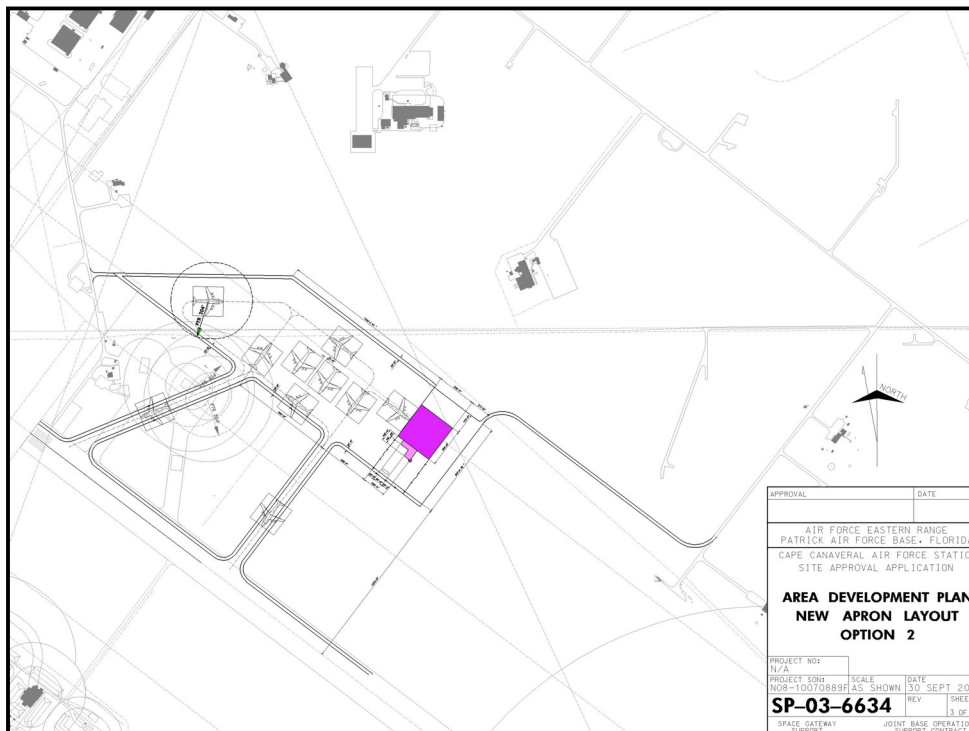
Site of proposed new facilities north of the Skid Strip (Option 2).
